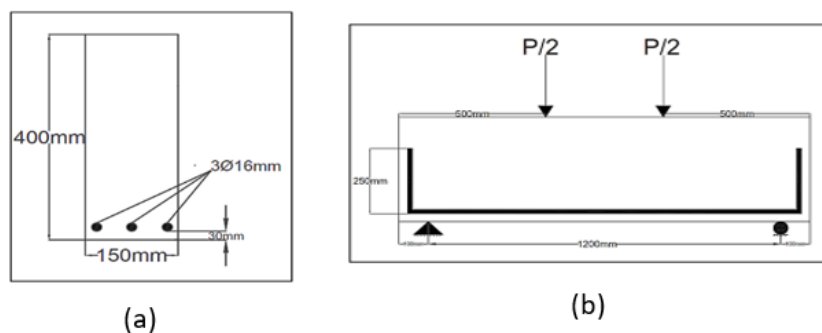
Specimens' details: a. cross-section, b. side view, and applied load.
